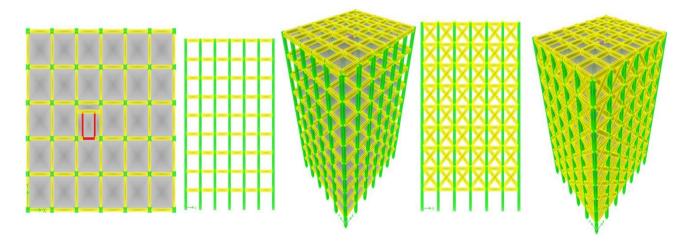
Plan, Elevation and 3D view of bare and infill frame for model-1 and model-2 respectively.
